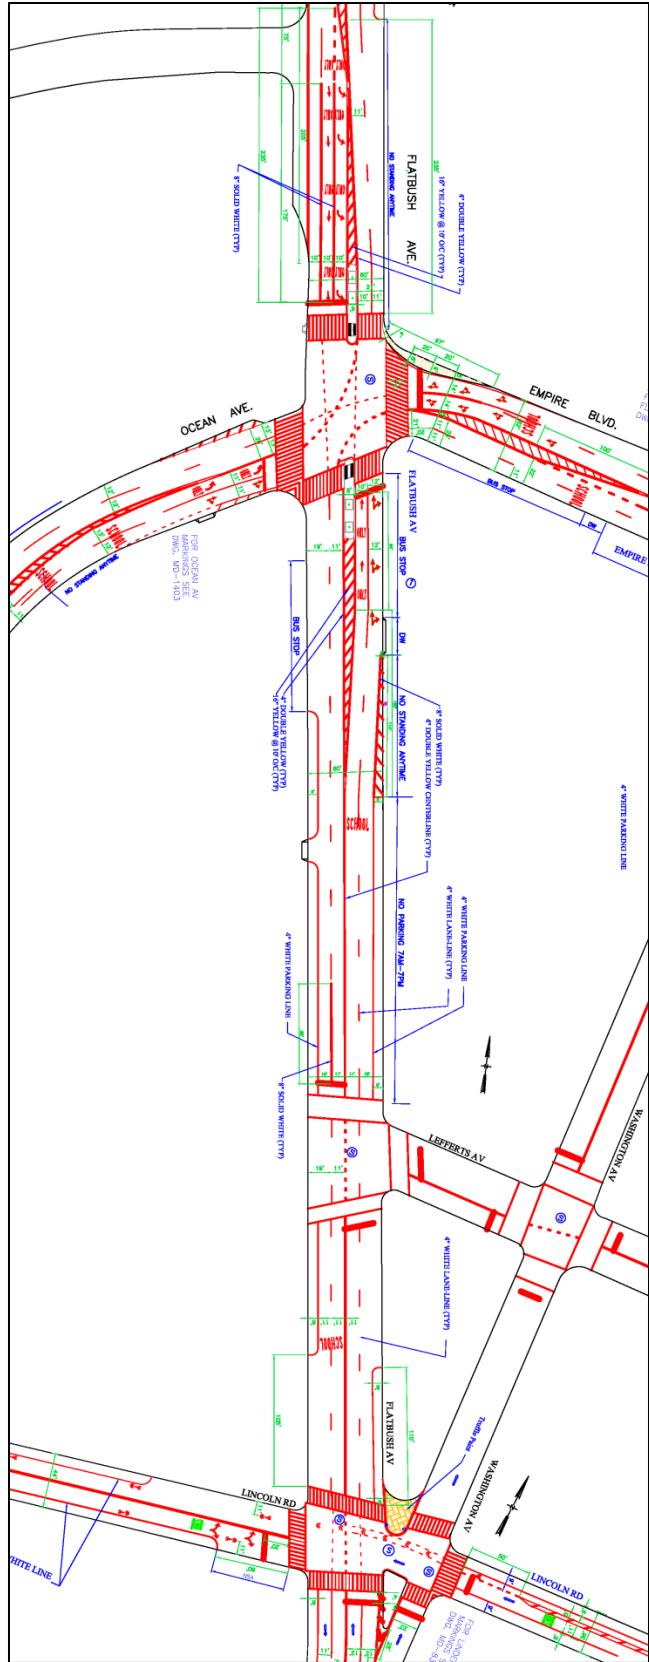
Flatbush Avenue between Ocean Avenue/Empire Blvd and Lincoln Road –Modified Design
